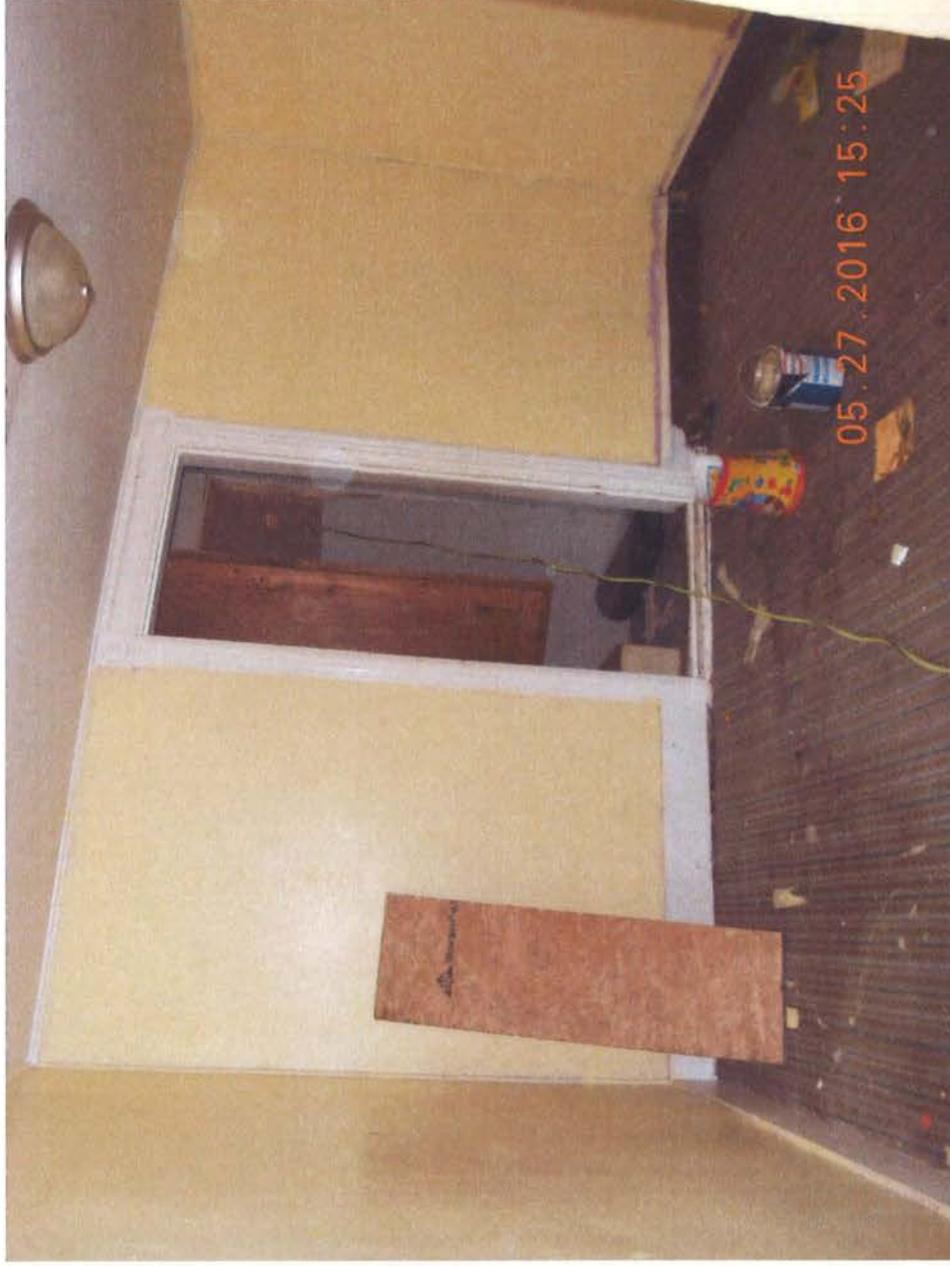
shows the stair case to the 2<sup>nd</sup> floor without the required means of egress such a width, headroom and stair rise and run dimensions as required by Code.
